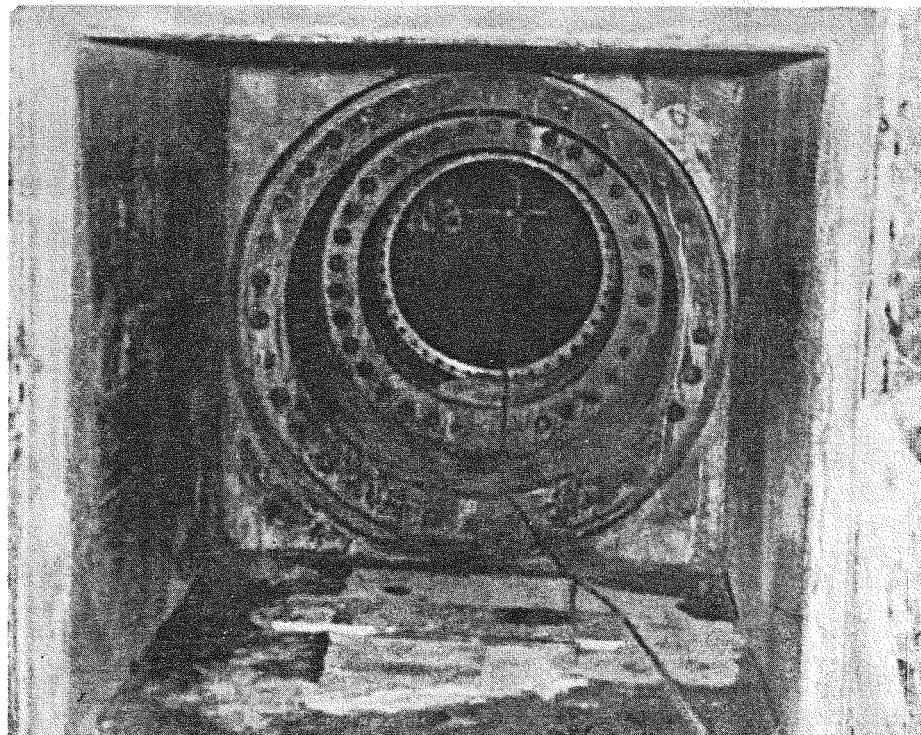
Looking through unfinished liner into 12-foot sphere. Bulkhead for Shots 1 through 4 in place
